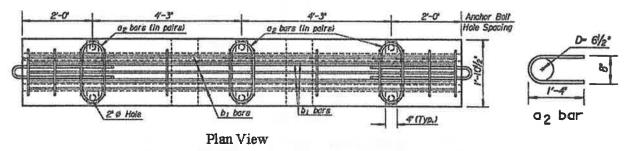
Anchor reinforcement for the Kansas system Source: Kansas DOT RD 622
